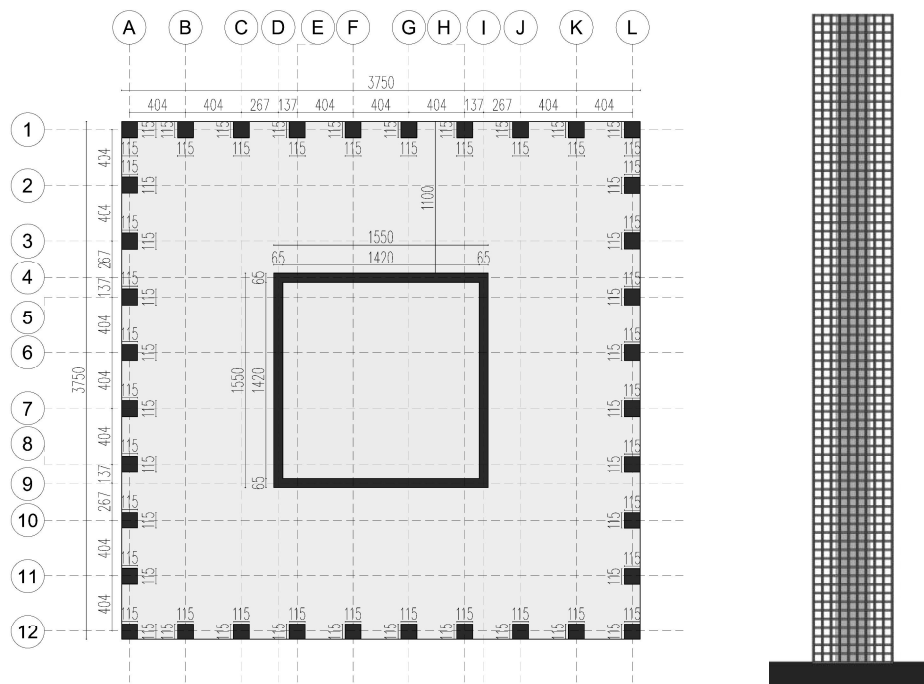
Typical floor plan and elevation of model FT_OPT_2
